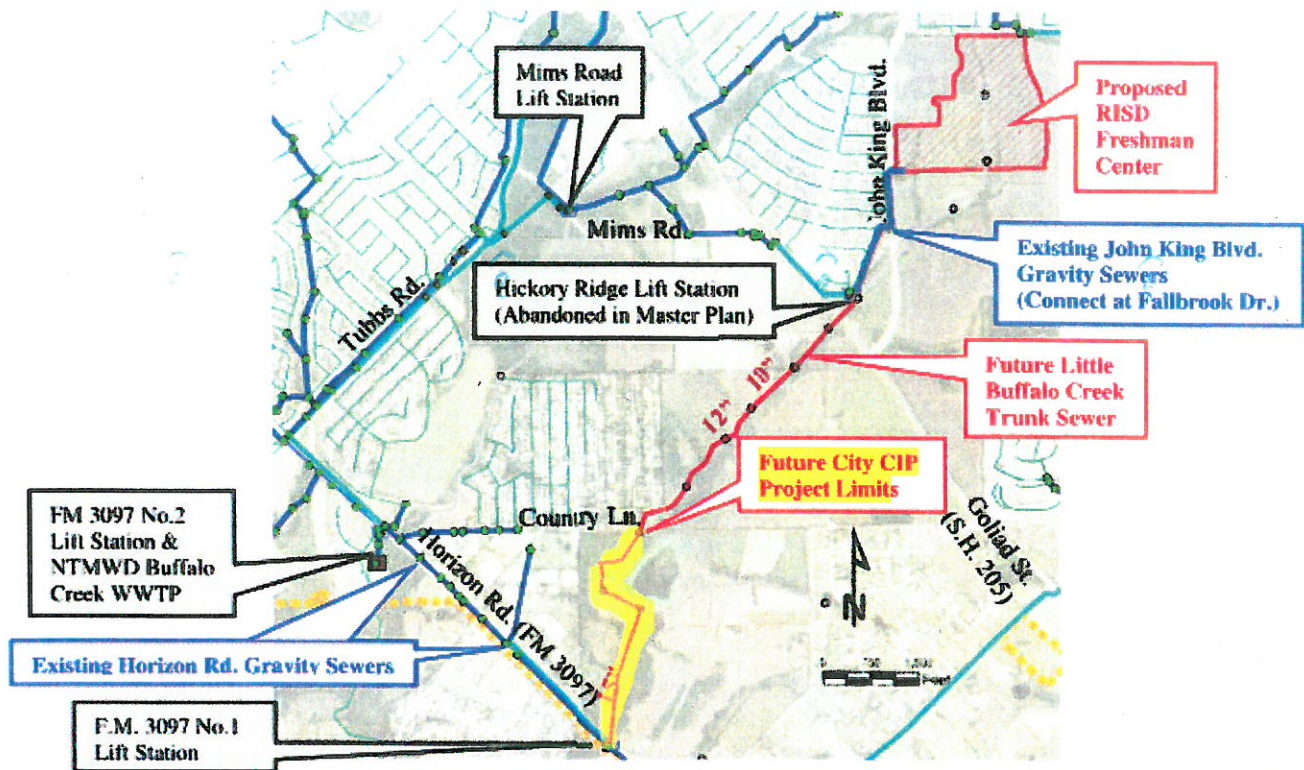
Future Little Buffalo Creek Trunk Sewer
